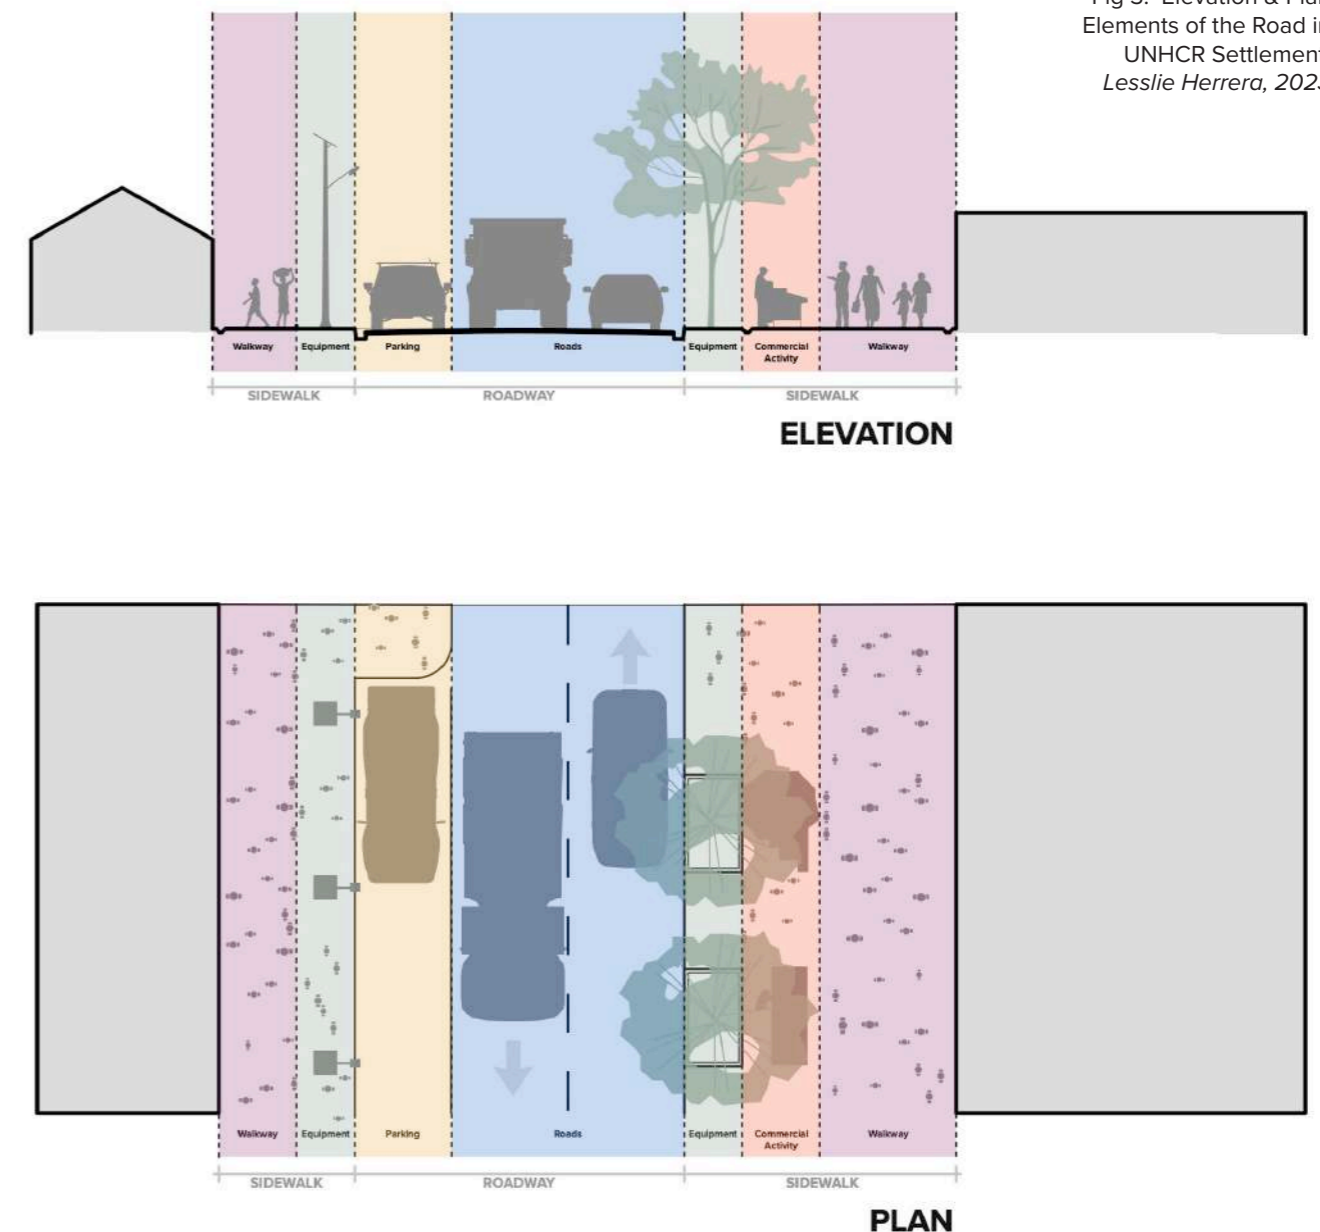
Elevation & Plan Elements of the Road in UNHCR Settlement. Lesslie Herrera, 2023
